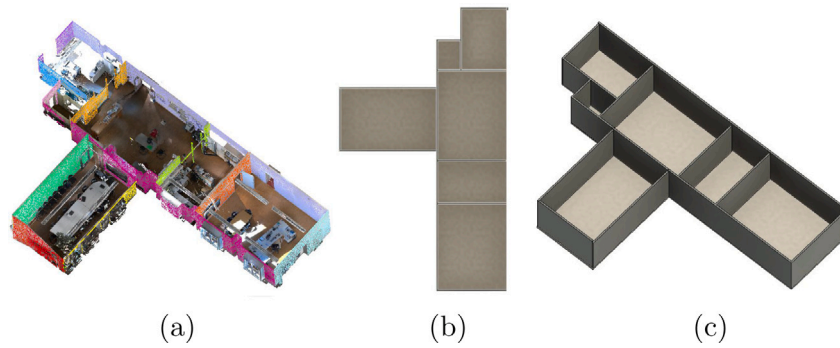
Design the parameterized building model: (a) separated 3D wall instances, (b) initial floor plan mask, (c) digital building model extruding from floor plan mask (ceiling were removed for better visualization).
